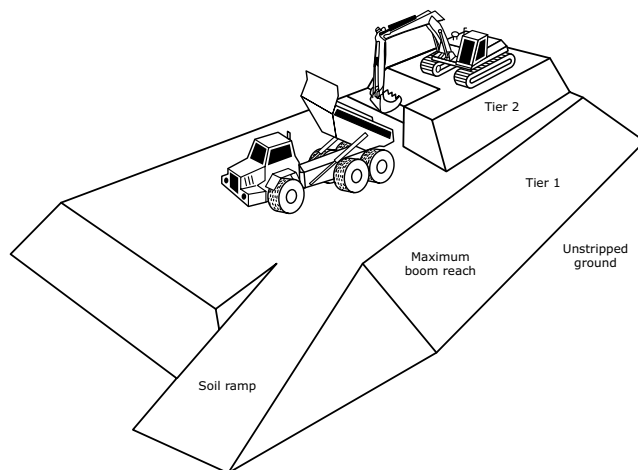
Excavation of soil storage mounds with excavators and dump trucks: Multi tier mounds.
